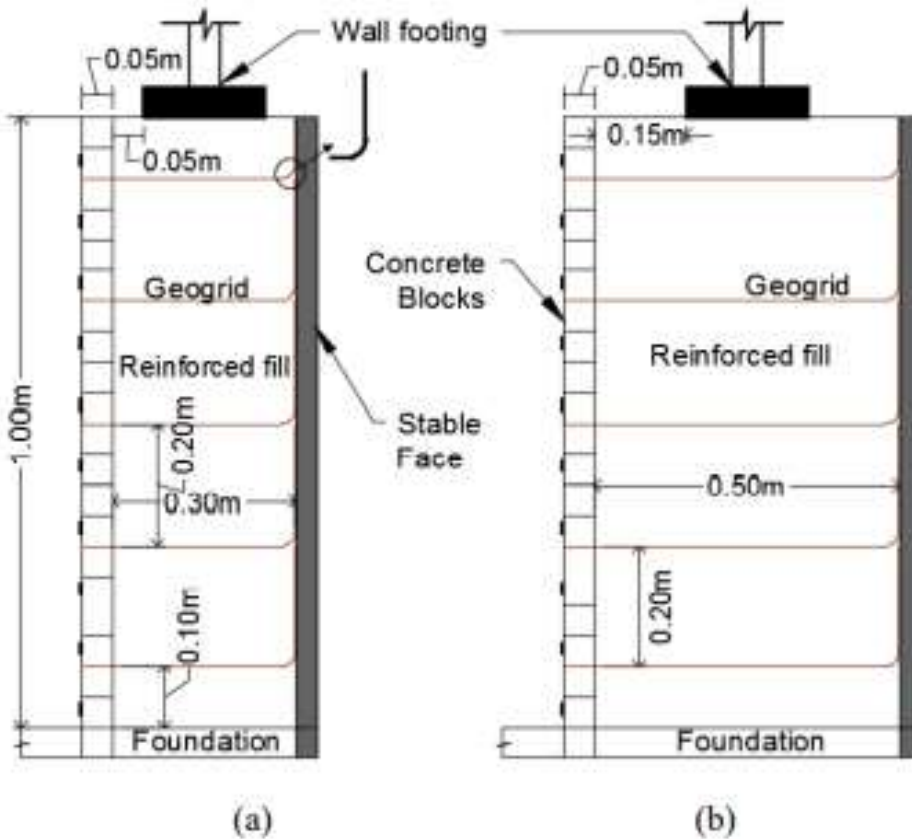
Test layout from models with reinforcement layers bent upward with a different aspect ratio (B/H) 0.3 H wall with footing offset of 0.05m (b) 0.5H wall with footing offset of 0.15m (Kakrasul., 2018)
